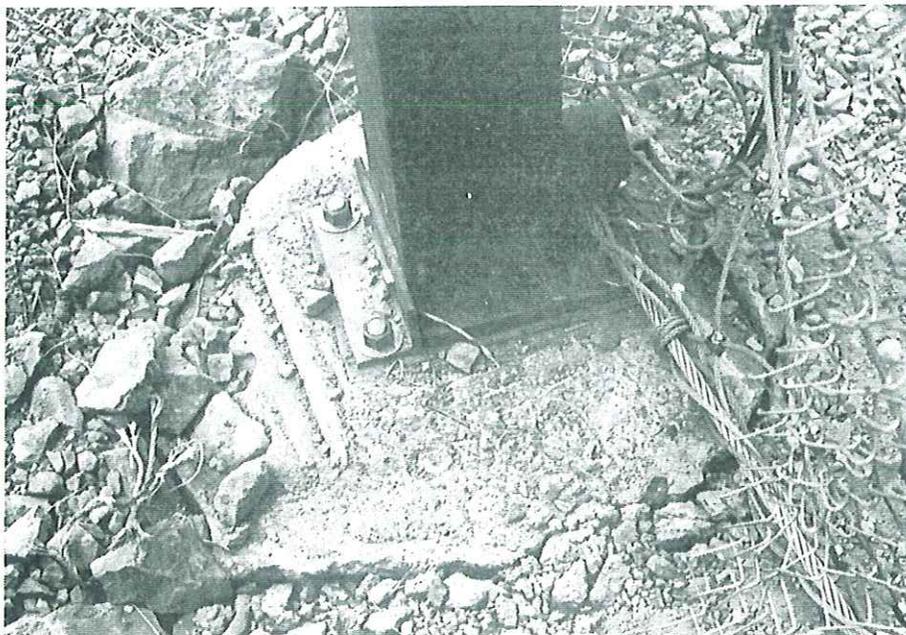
DETAIL OF BRUGG BASEPLATE POST ATTACHMENT
